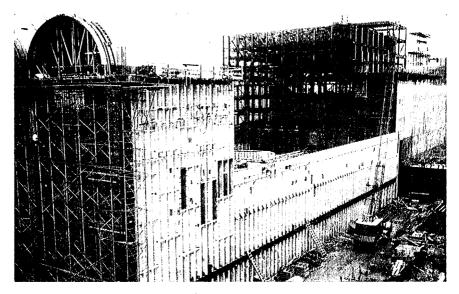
Precast concrete columns and steel framing, Metropolitan Opera House, New York
